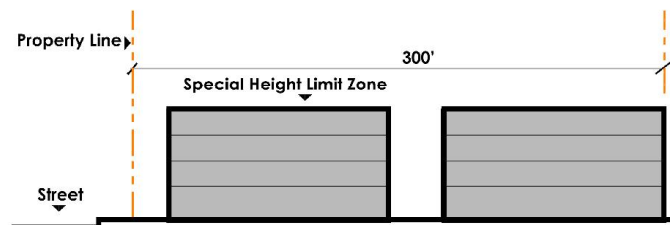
SPECIAL BUILDING HEIGHT LIMITS -
